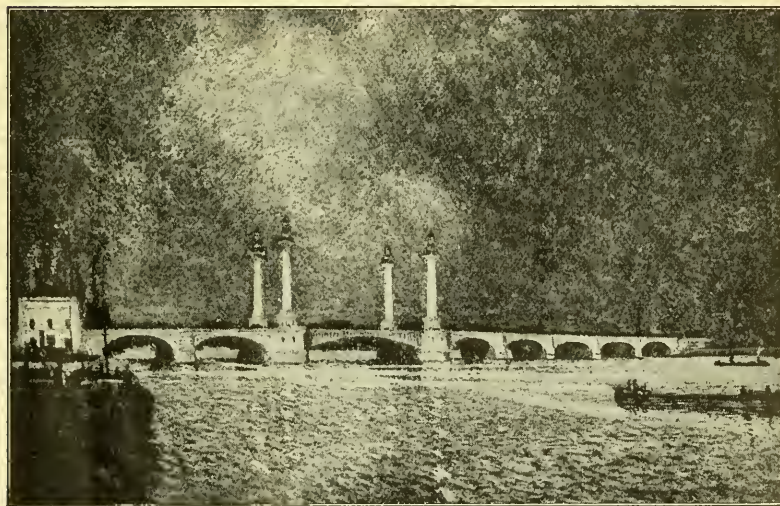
ARCHITECT'S DRAWING OF COMPLETED CHERRY STREET BRIDGE.
